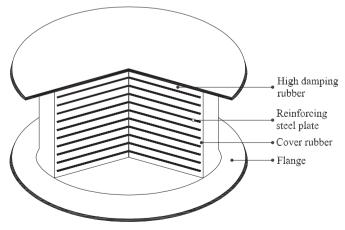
High damping rubber bearing (HDRB) cross-section from [6].
